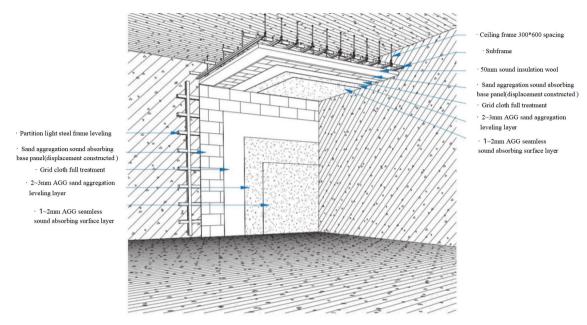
Sound absorbing construction sectional details of ceiling and walls.
